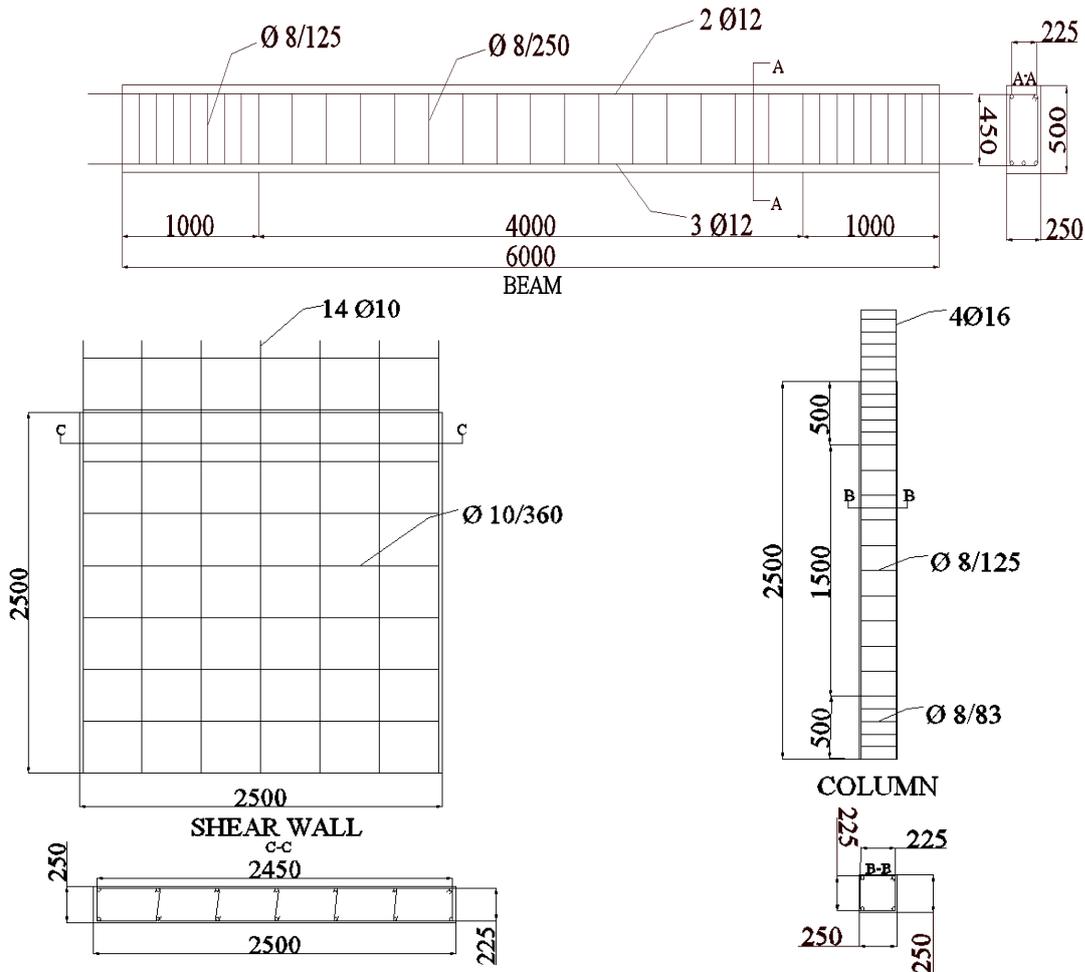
Reinforcement details of beam, column and shear wall belonging to Case 1 (all dimensions are in mm)
